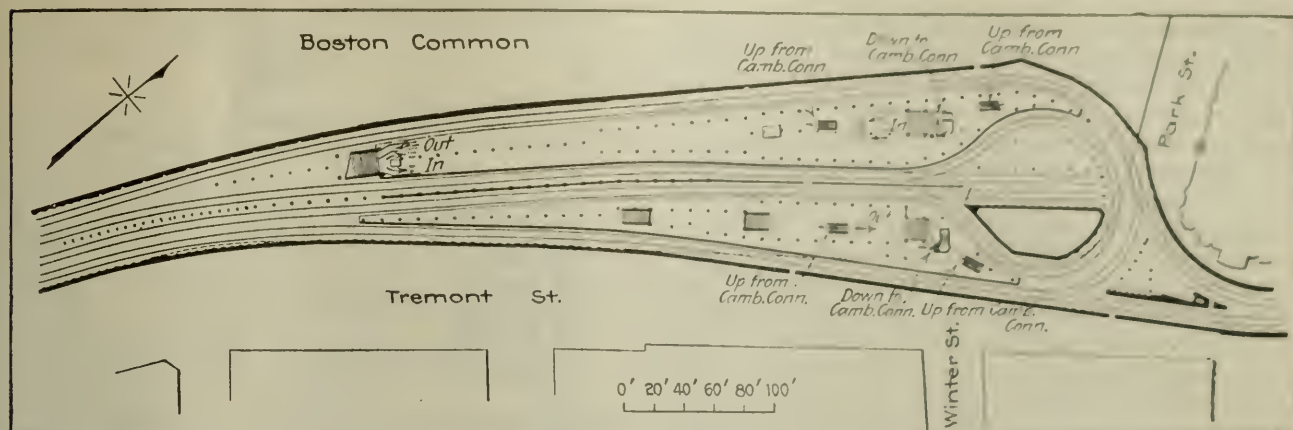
PARK STREET STATION ON BOSTON SUBWAY
